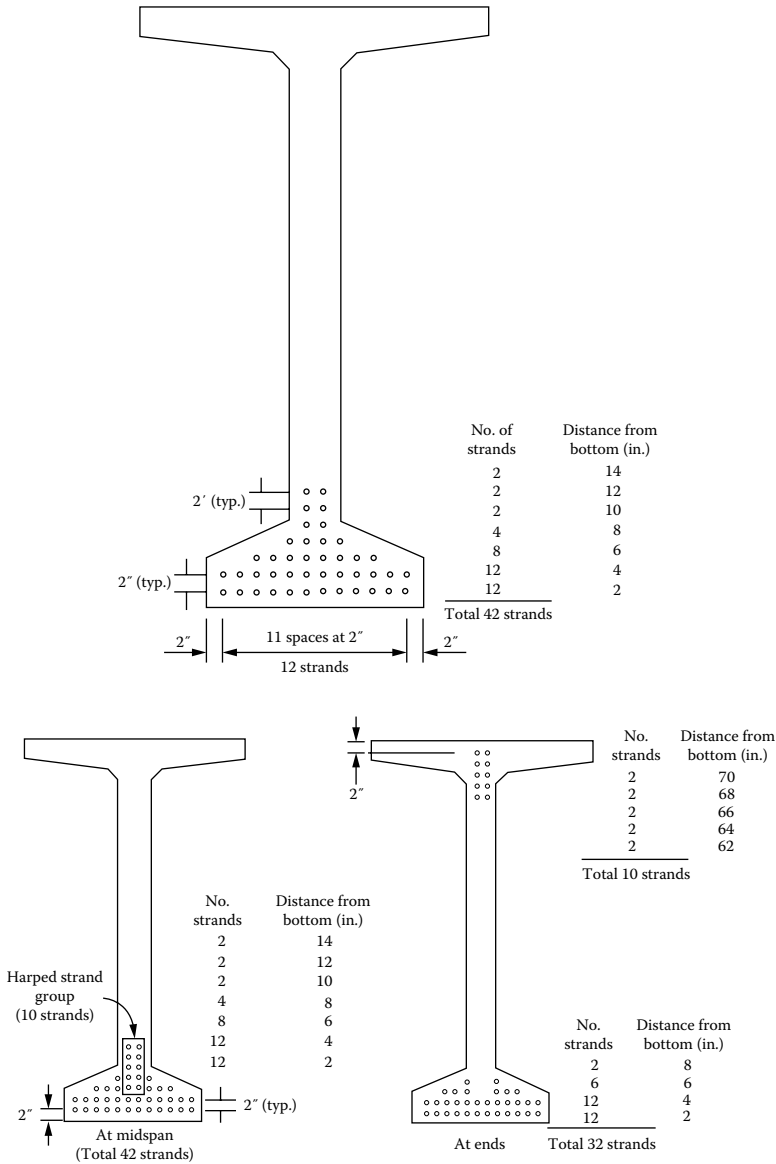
Strand pattern and profile in the girder. (Adapted from PCI, *Precast Prestressed Concrete Bridge Design Manual*, 1st ed., Precast/Prestressed Concrete Institute, Chicago, IL, 2003.)
